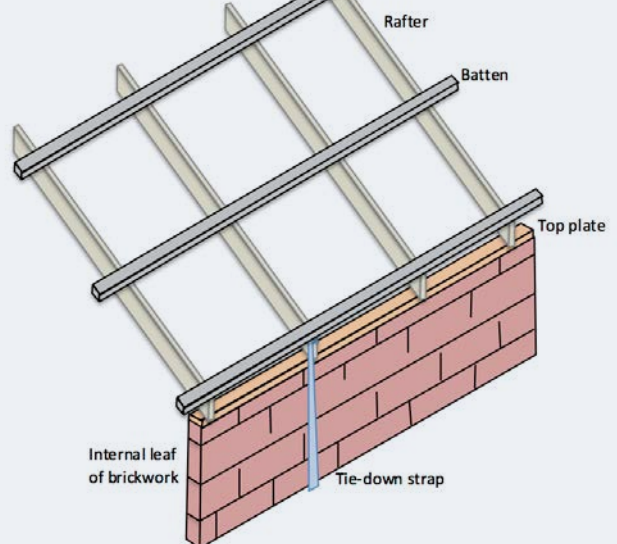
, Figure 7.4 and Figure 7.5 illustrate three commonly used configurations of tie-down details used with tie-down straps embedded in the internal leaf of cavity brick walls that comply with Section 3.3.3 of the BCA Volume 2. The connection at the top of the strap in all three details can be designed to resist the tie-down forces calculated for the tie-down spacing using Table 9.13 in AS 1684.2 or AS 1684.3. An appropriate nailed or screwed connection into the strap from Table 9.21 in AS 1684.2 or AS 1684.3 can be selected to carry this force.
